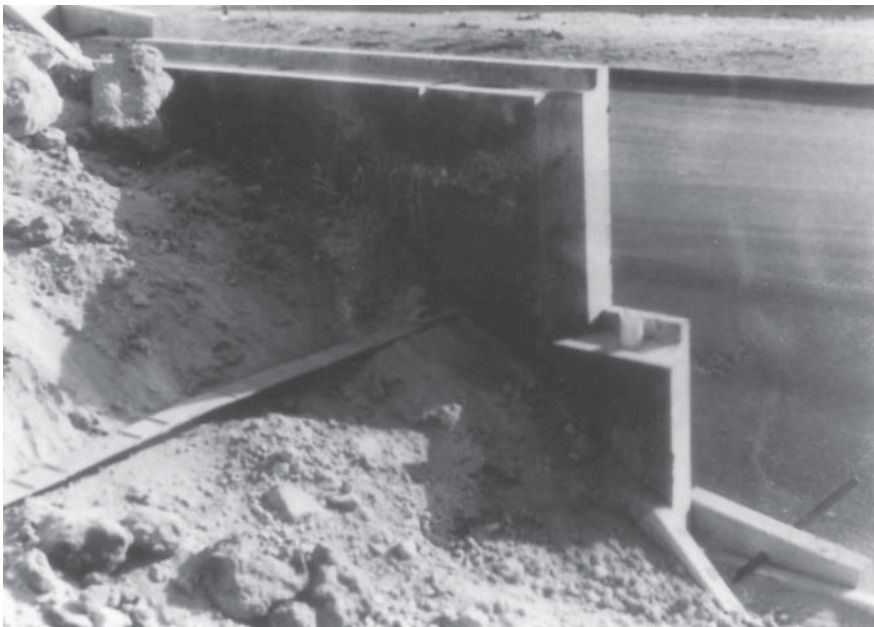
Metallic strip attachment to the precast concrete slab used as the skin (Courtesy of Braja M. Das, Henderson, NV)
